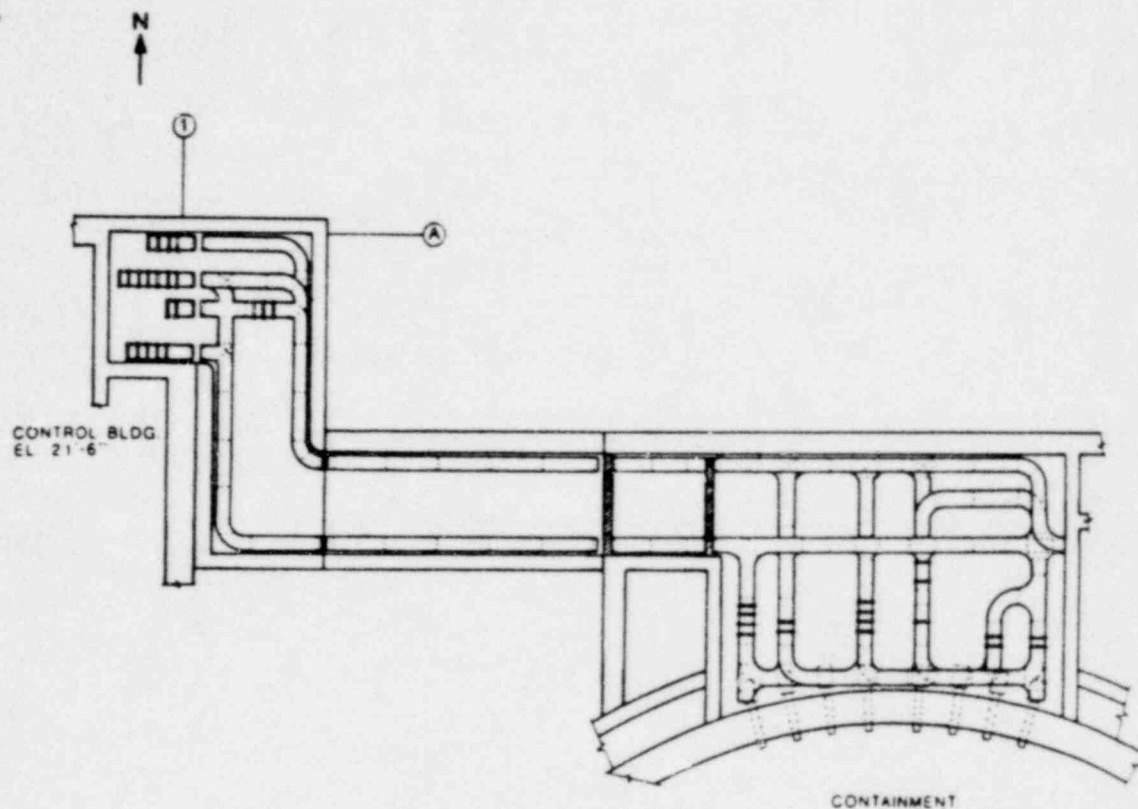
The typical cable tray configuration in the tunnel area is floor-to-ceiling, with up to 10 tiers. One side of the tray is supported using a floor-to-ceiling column. The other side of the tray is braced with struts attached to embedded steel channel in the concrete wall. The trays are connected to the ceiling using the standard connection detail either bolted or welded to overhead structural steel wide-flange beams. The floor connection is made by welding to a base plate either embedded or bolted to the floor. Cable tray loading in this area does not exceed 40 plf. Seismic gaps are evident here.
